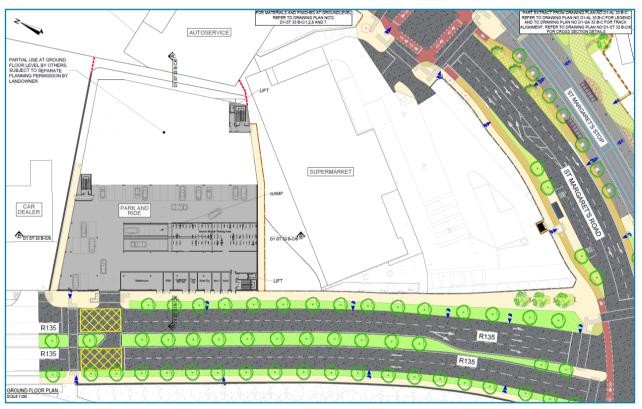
Proposed P&R Ground Floor Layout adjacent to Lidl
